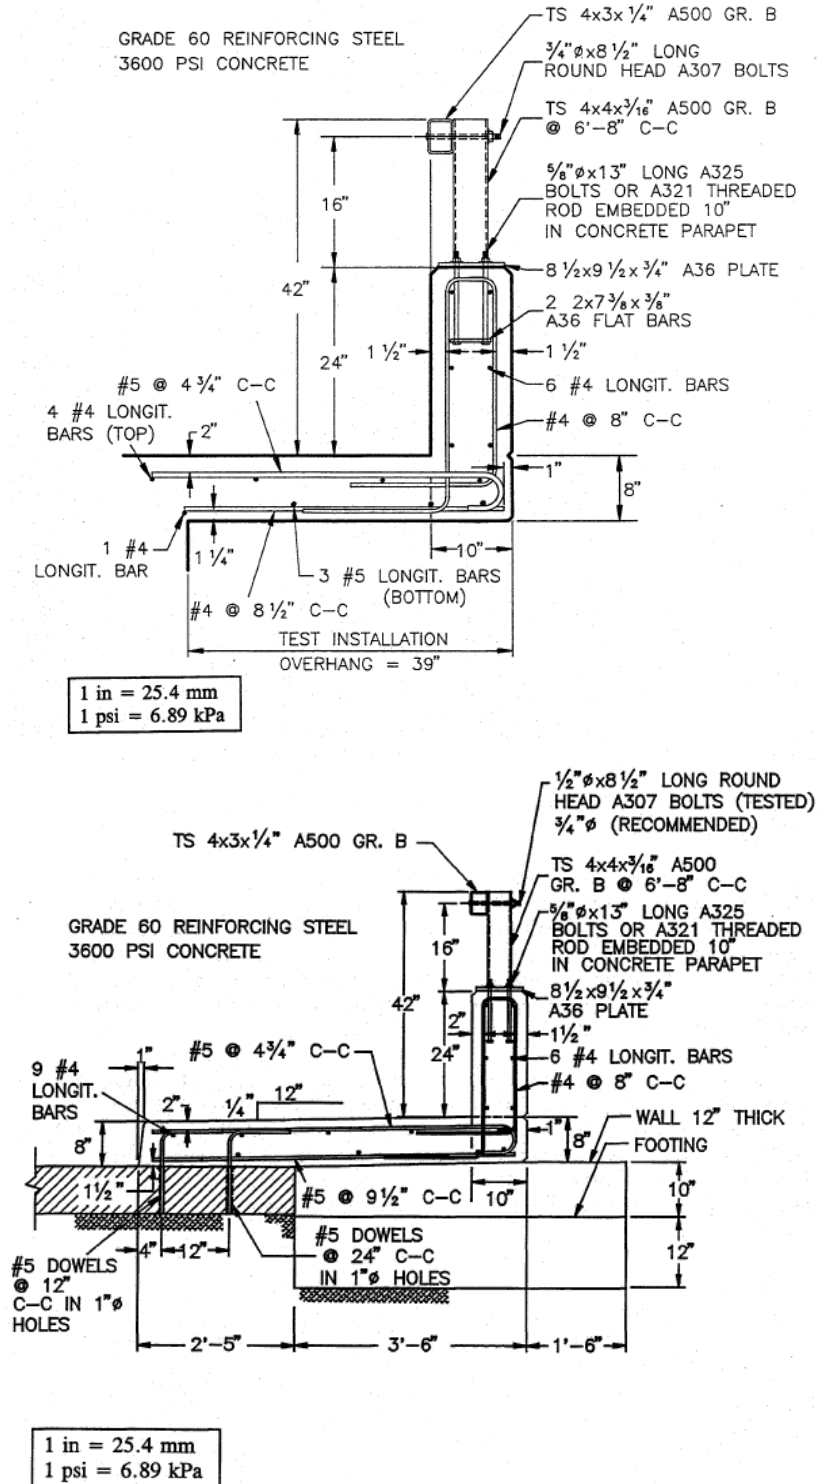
BR27C Design on Concrete Bridge Deck and Sidewalk
